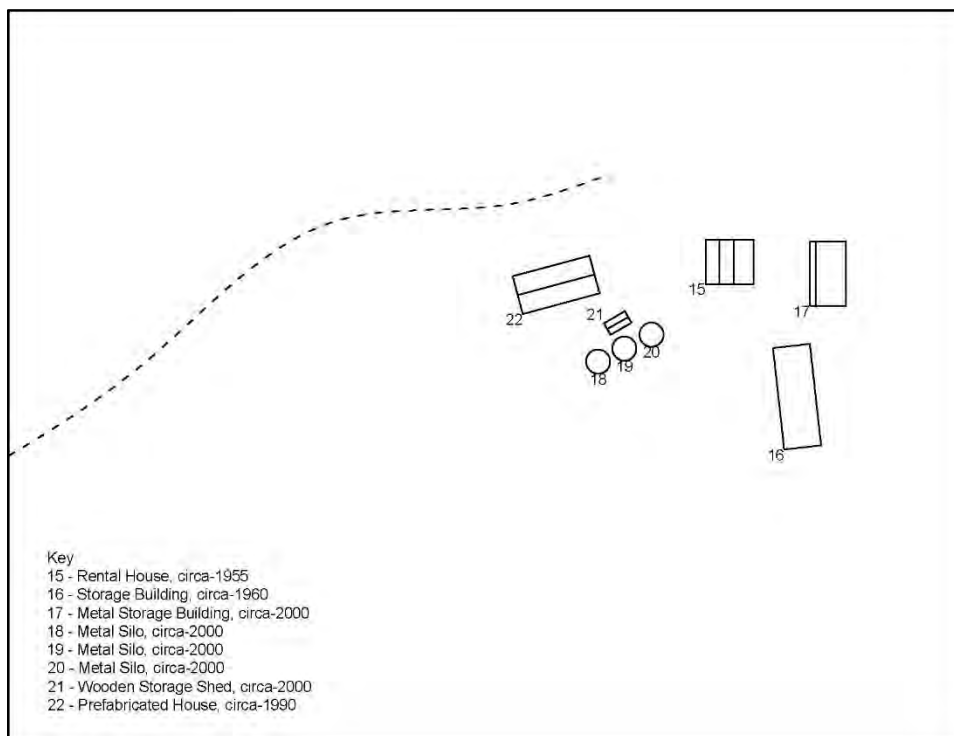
Site plan of Underwood Farm, eastern portion.
